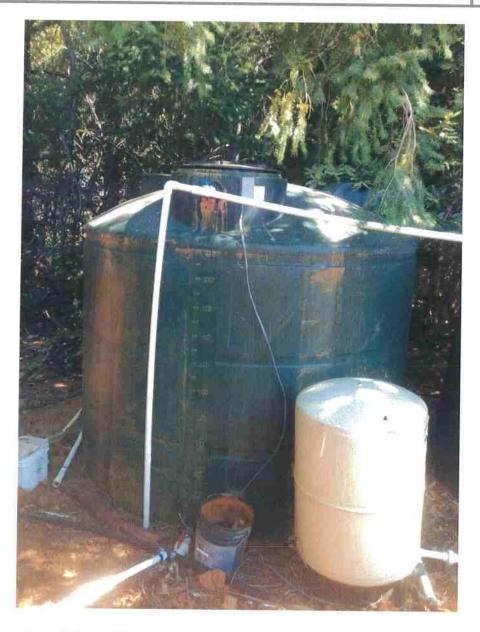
One 3,000 gallon poly water storage tank. Photo date 8-15-16
